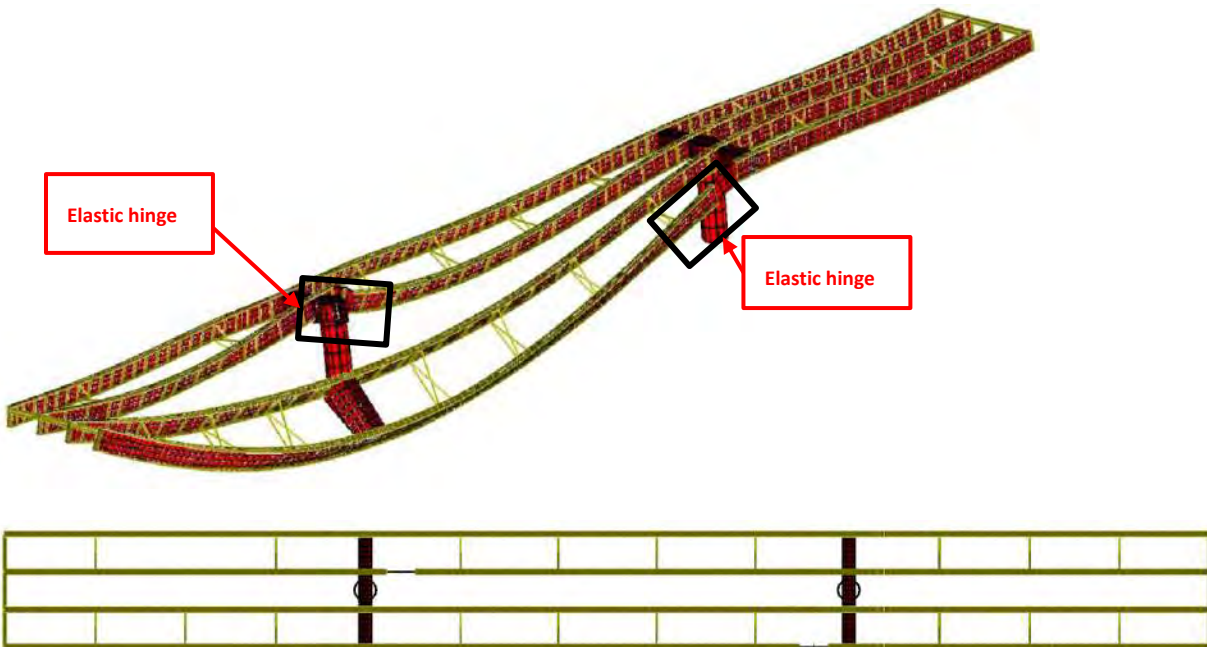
Framing Plan after Elastic Hinge in Girder D at 0.25xHL93 (Deck not shown for clarity)
